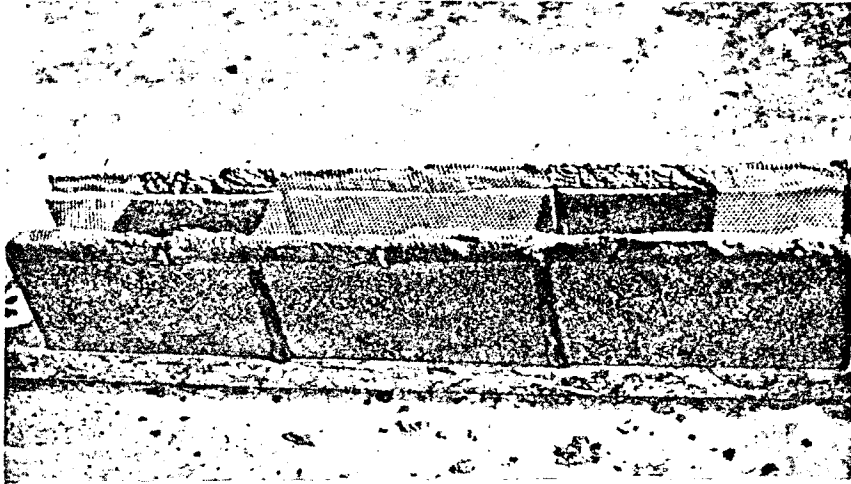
Initial bond beam course showing plastic netting used to confine grout flow.
